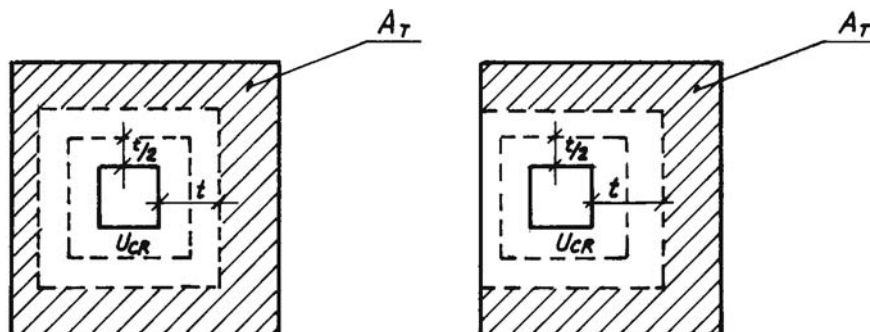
Dimensioning of shear reinforcement area  $A_t$
